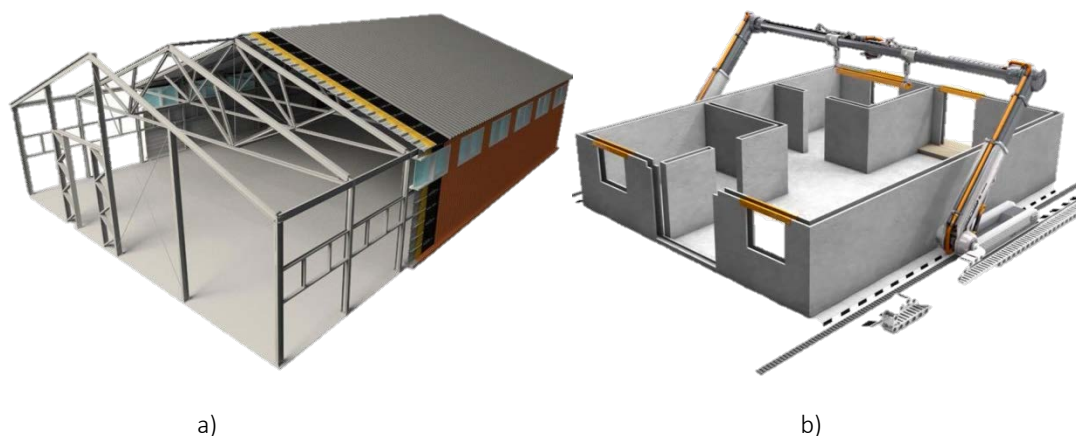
Technologies of prefabricated buildings and structures: a) frame [4]; b) frameless [5]
